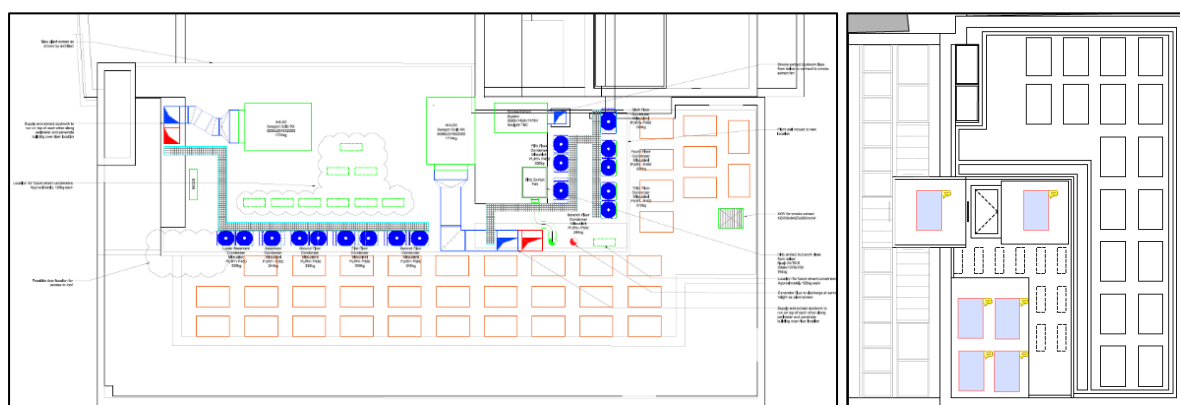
The potential PV layout on both the commercial (left) building and residential (right)
